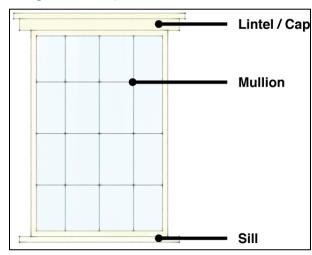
Window treatments shall include lintels/caps, mullions, and sills. A window's height shall be at minimum 1.5 times its width (Source: T&M Associates)
